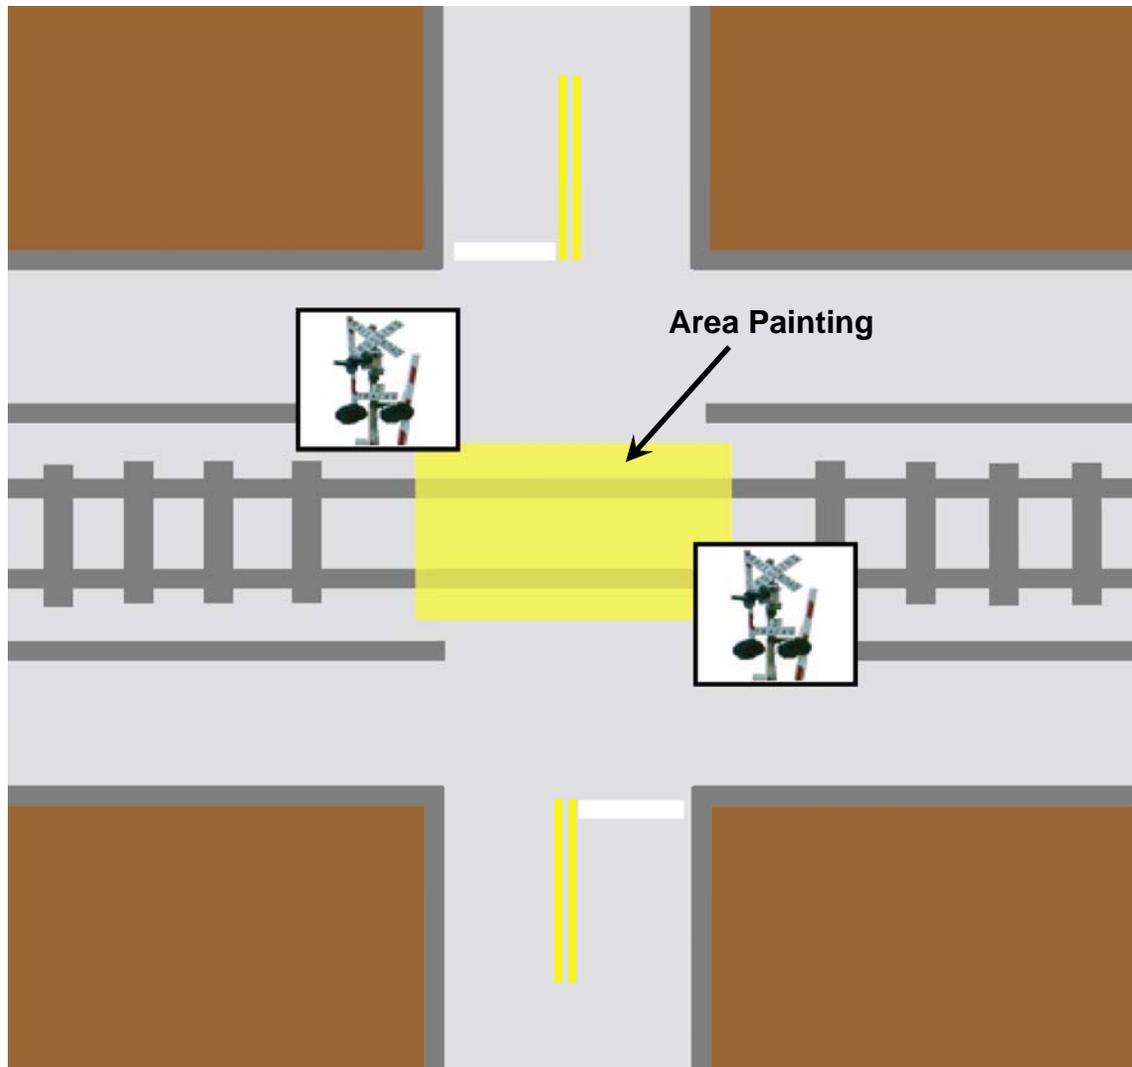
Plan view of treatments (area painting) at the Central Avenue grade crossing.
